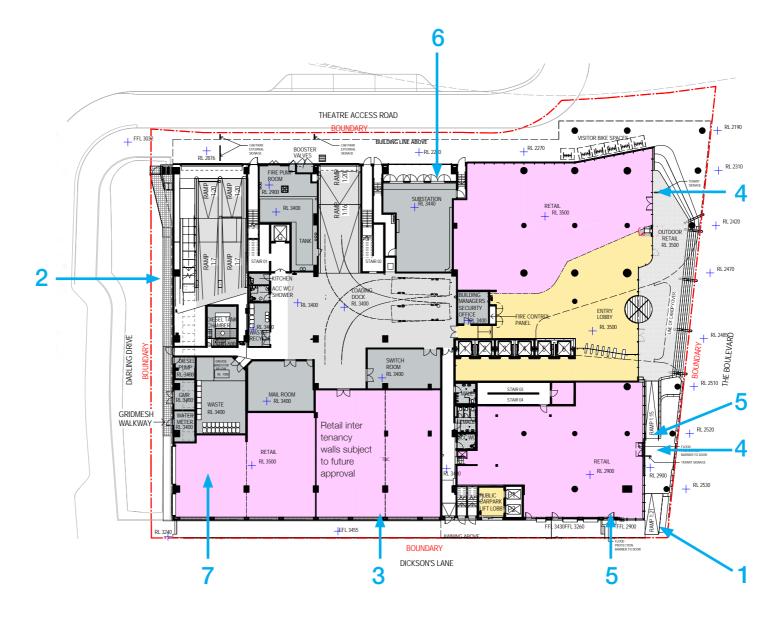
Section 96 NW Plot Ground Plan Design Proposal
